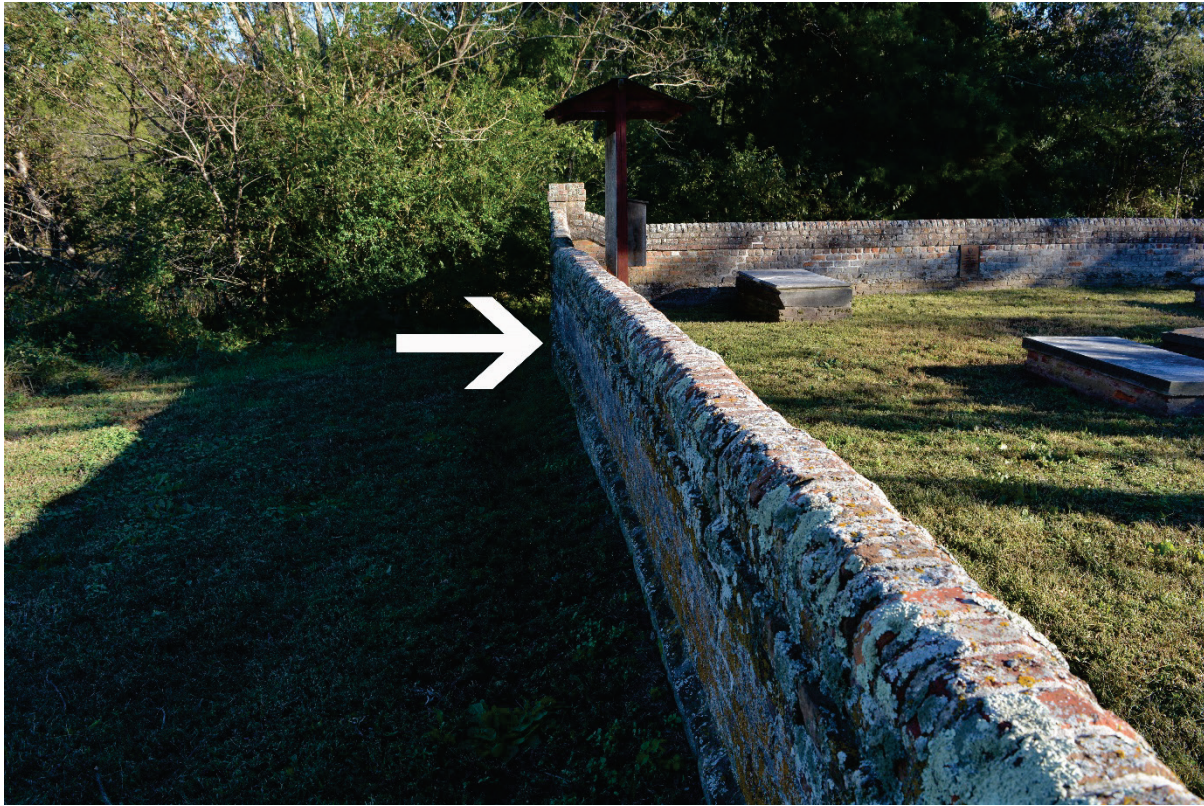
Cemetery wall. This photo shows the bulge in the northeastern wall at its eastern end.
